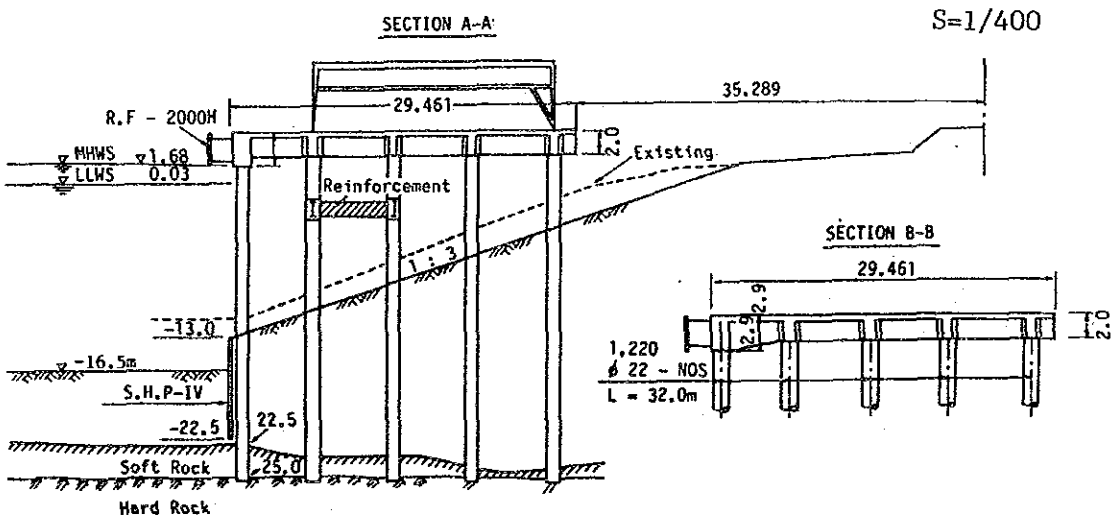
Typical Section of 100,000 DWT Berth
